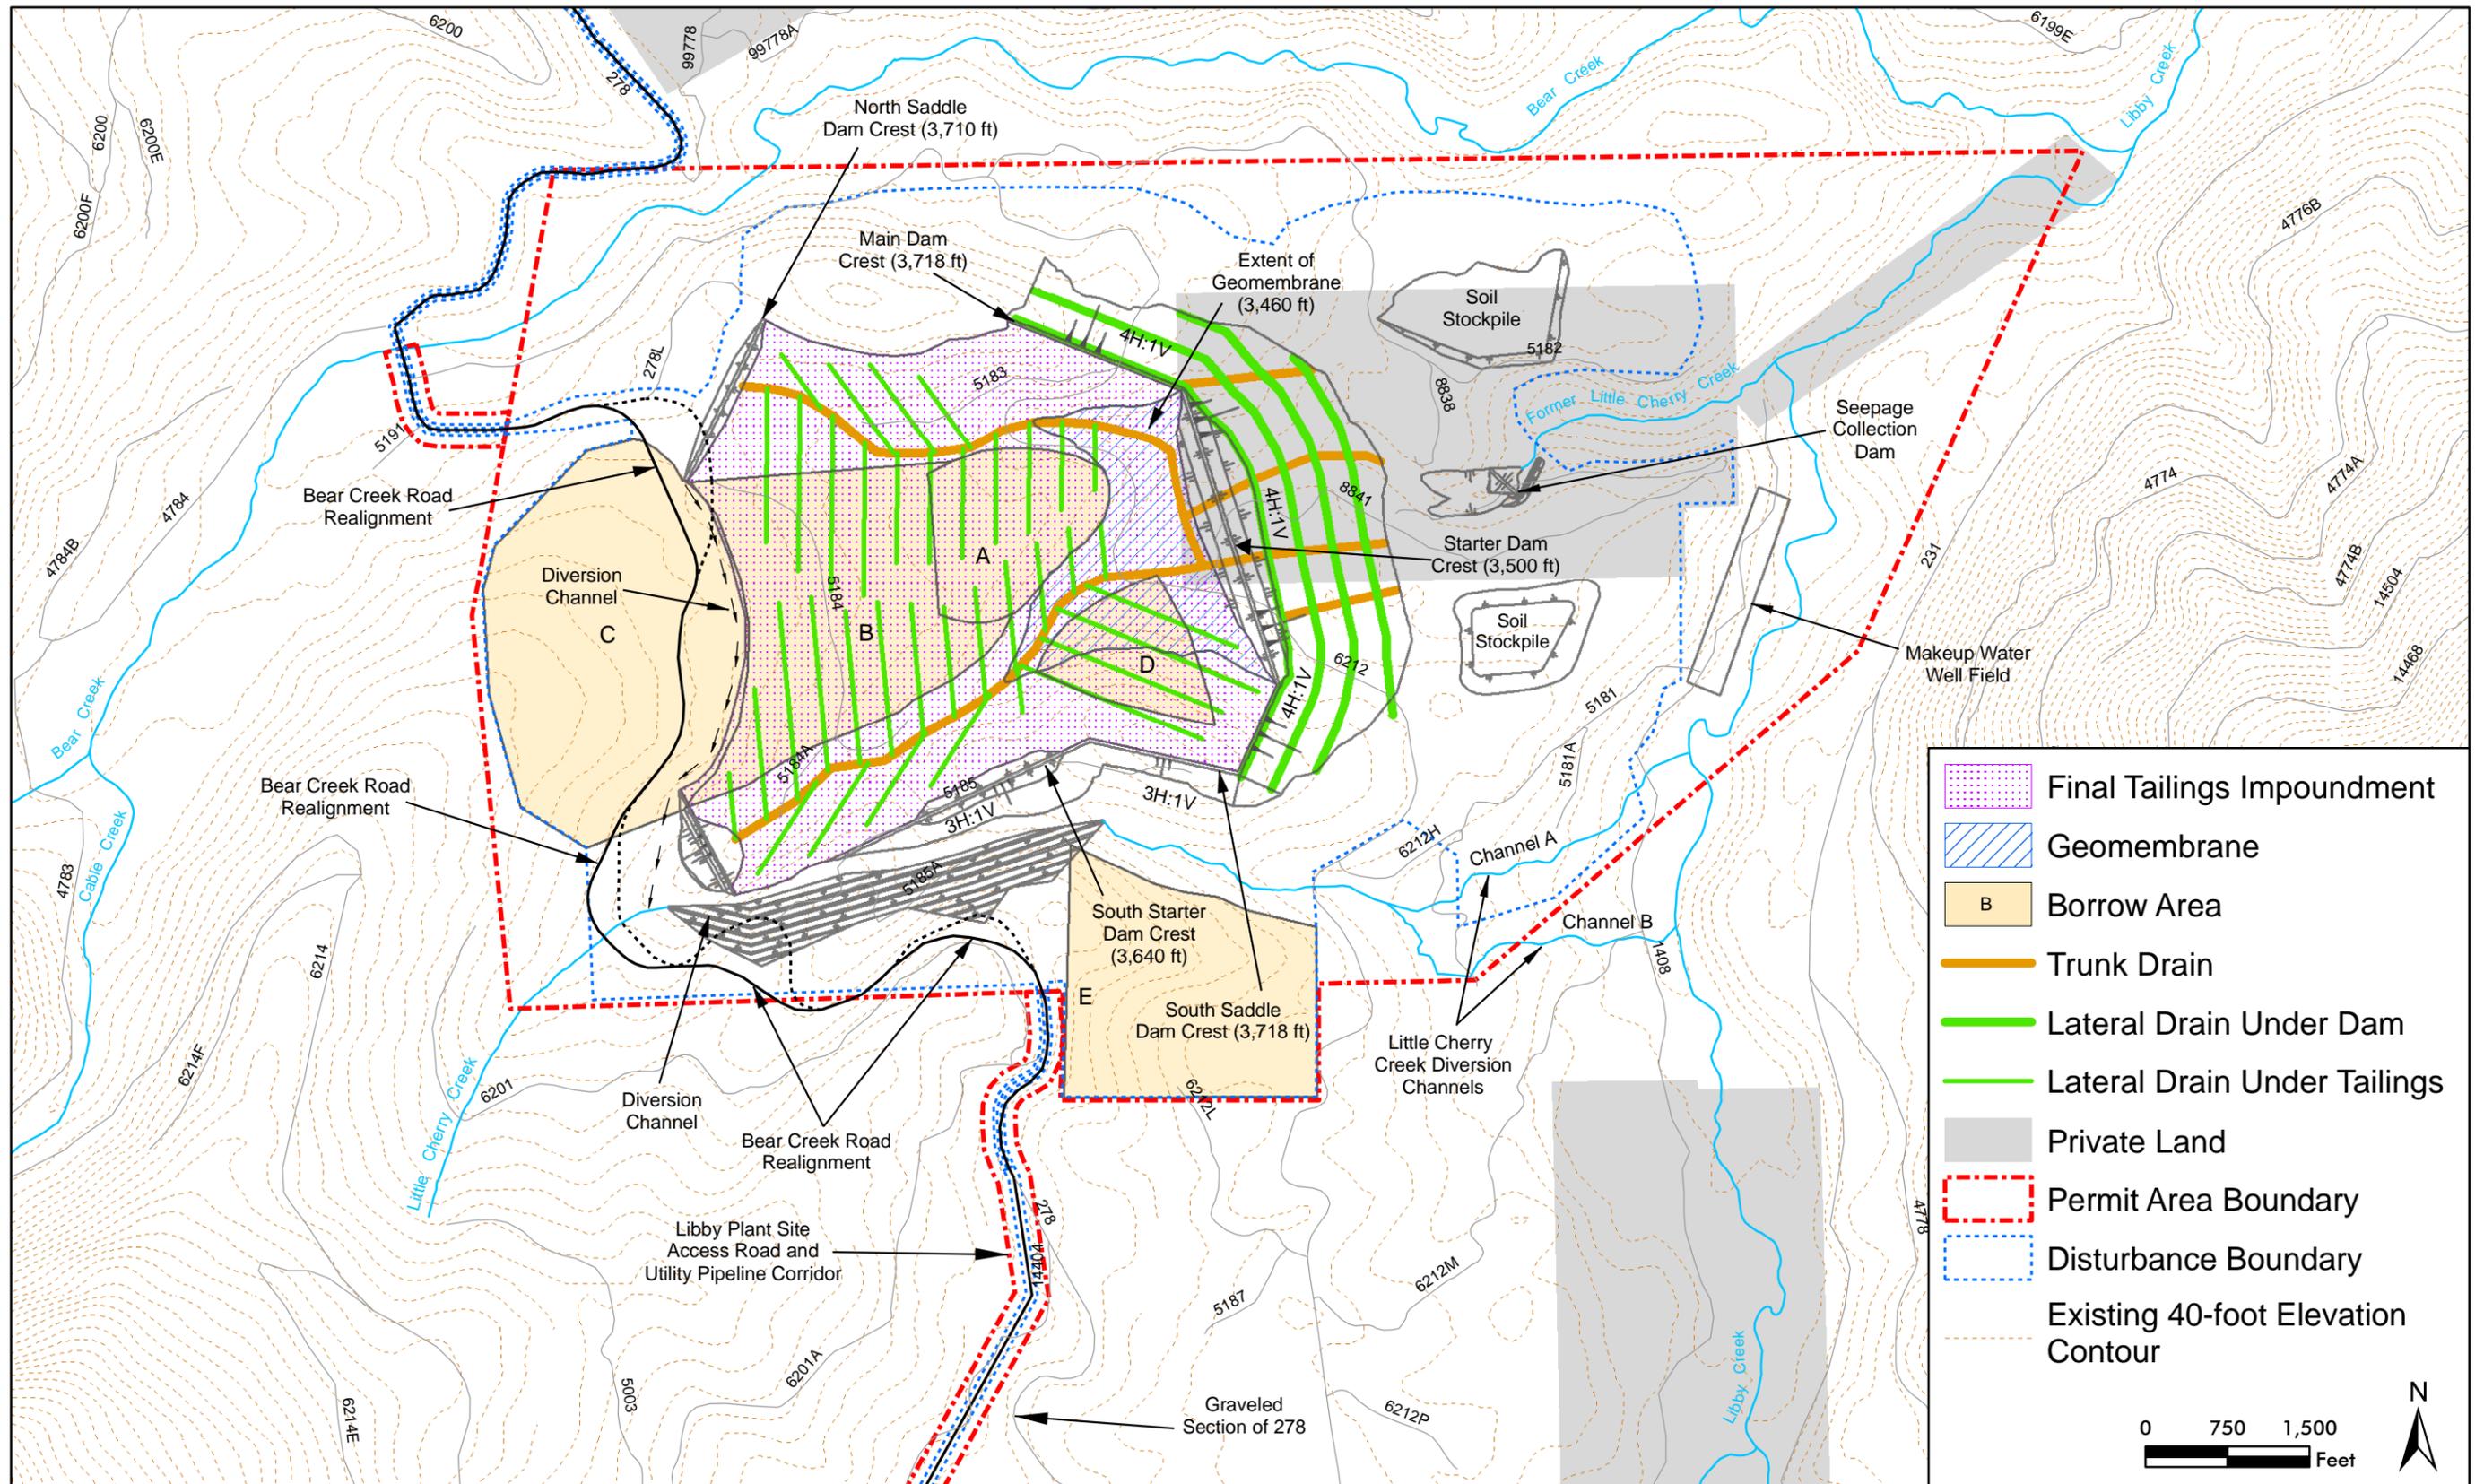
Little Cherry Creek Tailings Impoundment Site, Alternative 4
